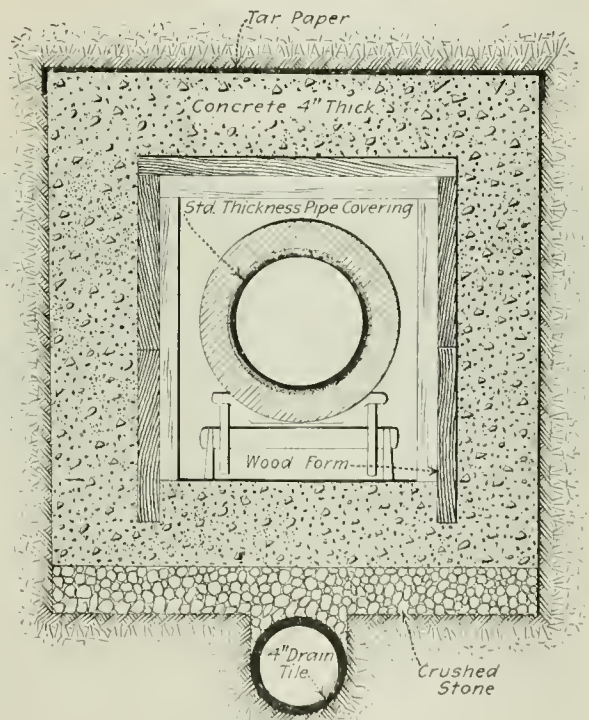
CONCRETE CONDUIT FOR UNDERGROUND PIPES
